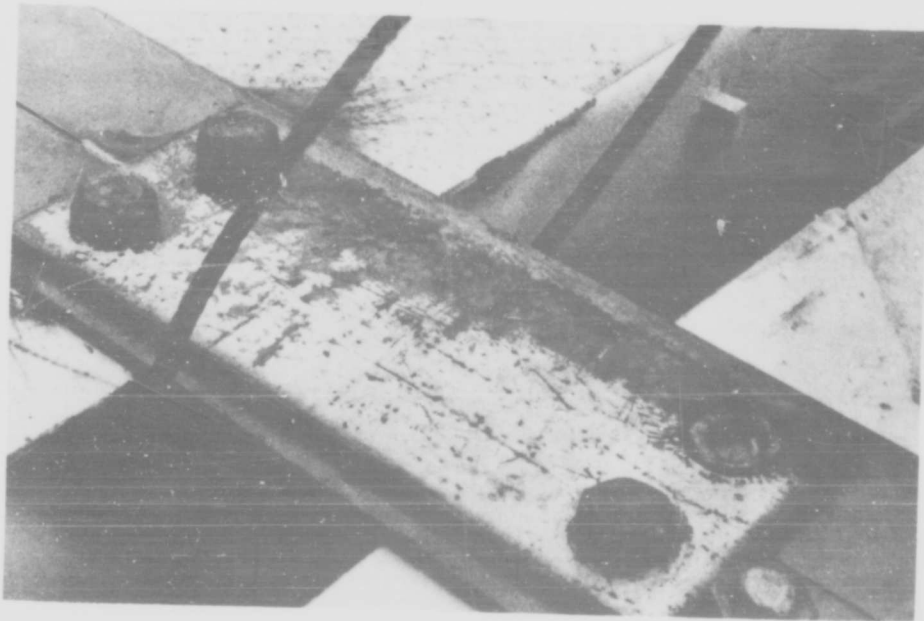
A6 bolt failure on 3 x 12 ramp barge.
